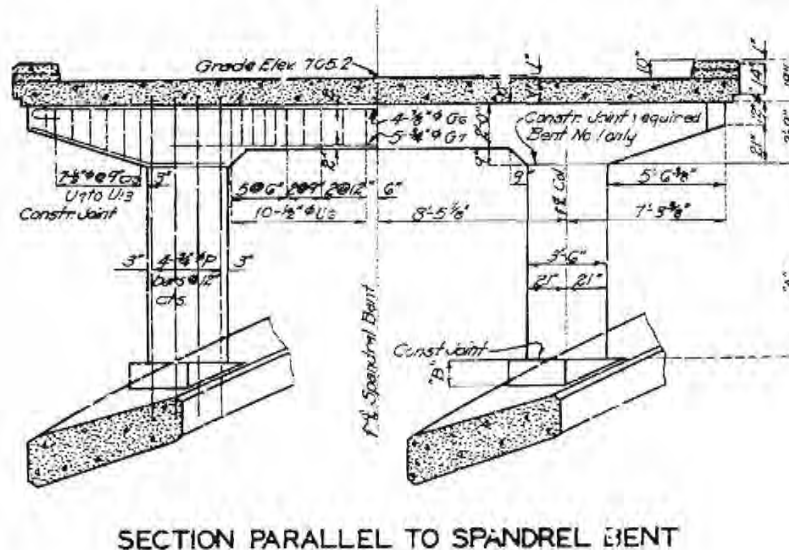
Spring Valley Bridge (J0420) Typical Section through Arch Span
